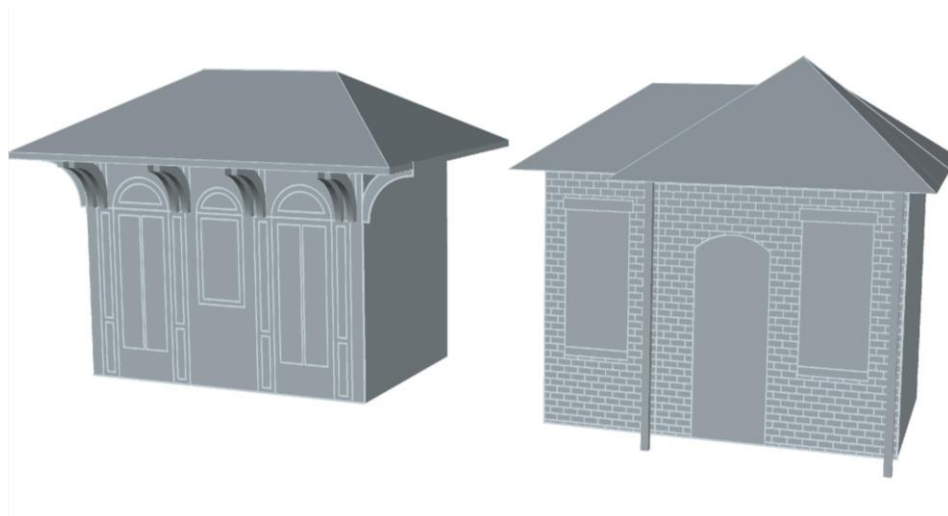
(left to right) 3D CAD Façade Drawings of Quinebaug Railroad Station and Belding's Guard House
